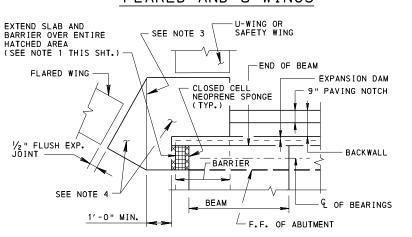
DETAIL FOR SKEWED ABUTMENT WITHOUT BACKWALL FLARED AND U-WINGS
